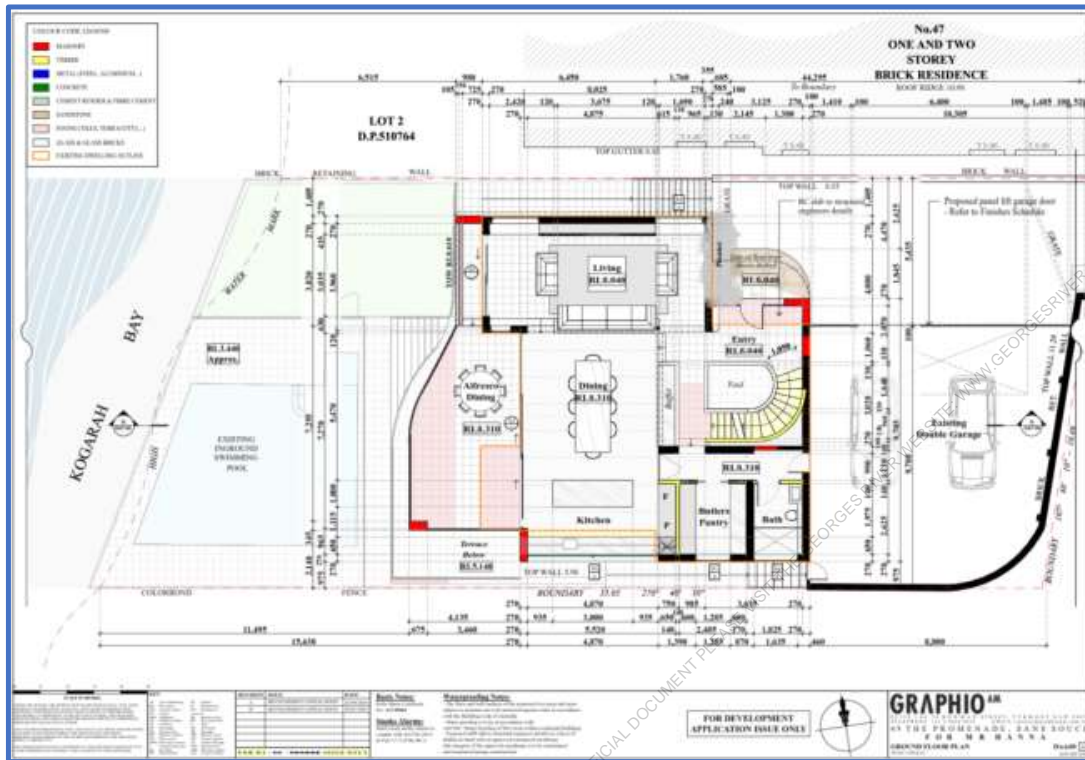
Ground Level – alterations (Source: Amended Architectural plans)
